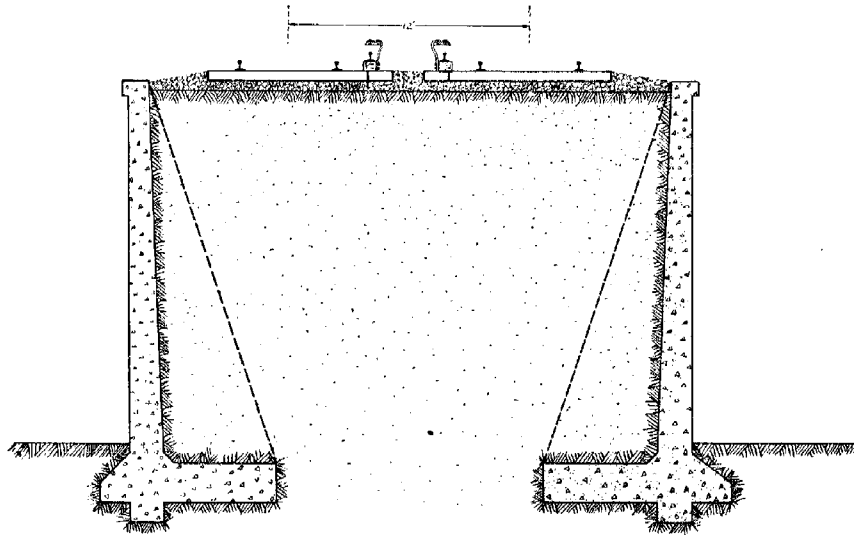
Solid fill elevated—Typical cross-section.
